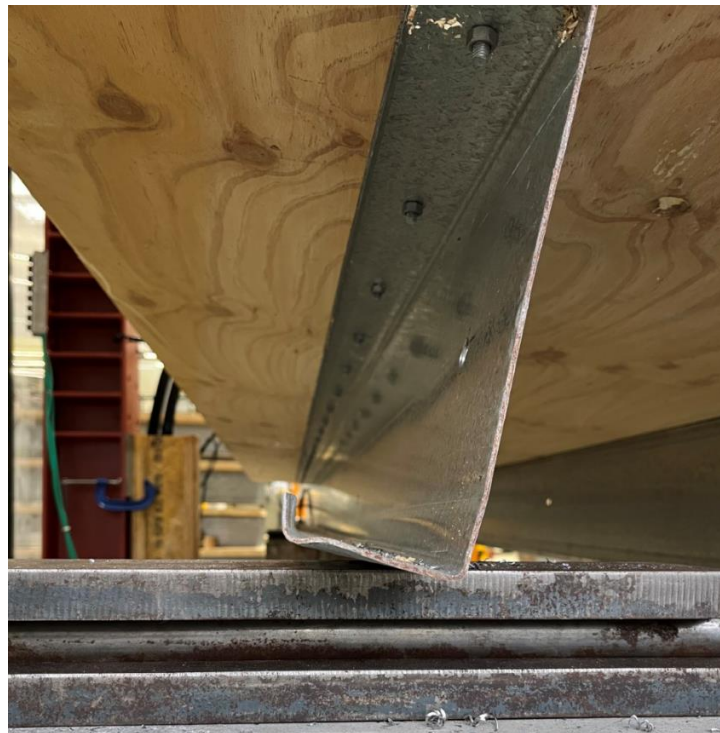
Bottom flange rotation and bending near the supports (Specimen SP-10)
